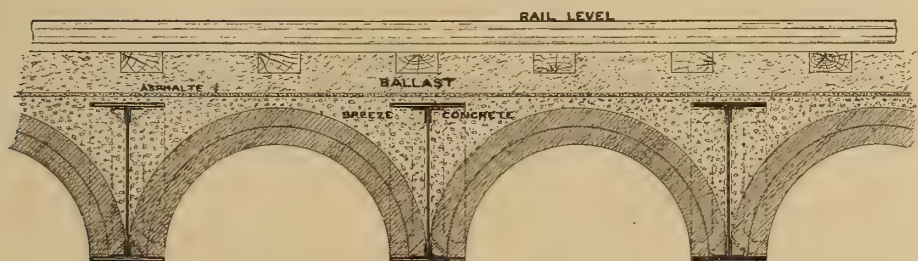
BRICK JACK ARCHES BETWEEN CROSS GIRDERS. (MAIN GIRDERS NOT SHOWN)
